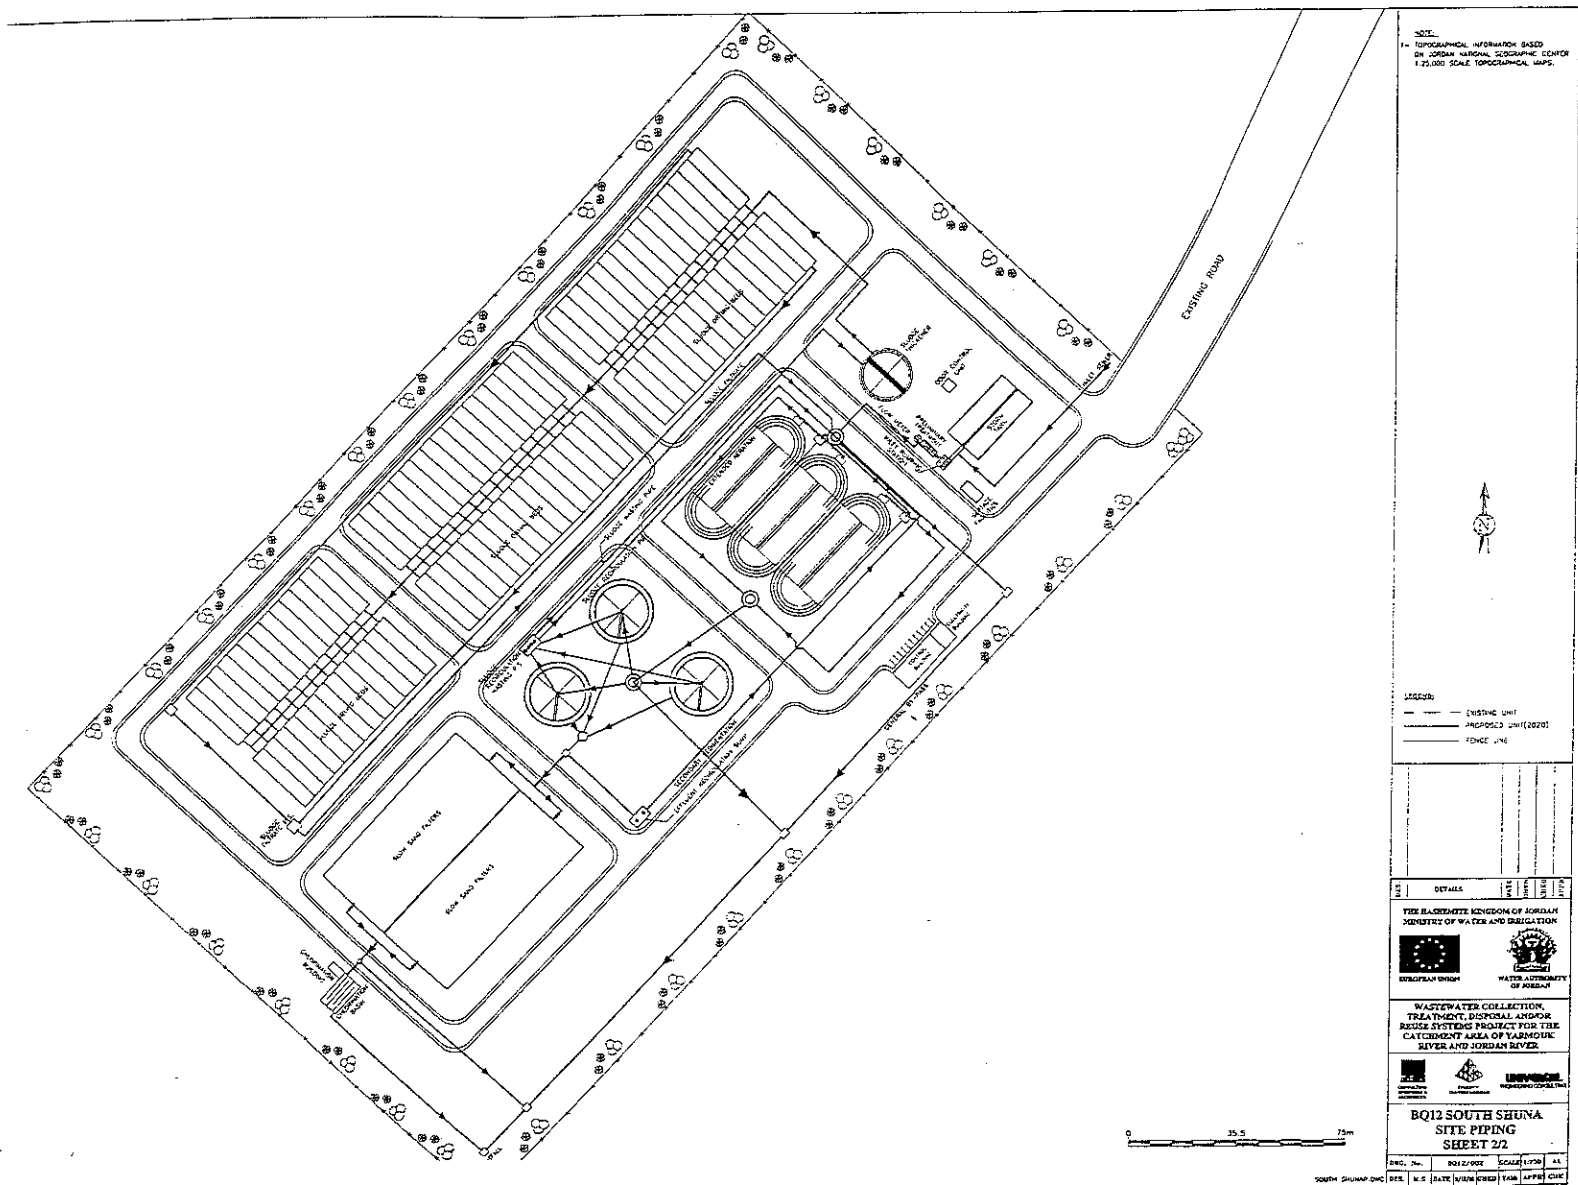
Layout of Proposed Wastewater Treatment Plant - SHUNA SOUTH
